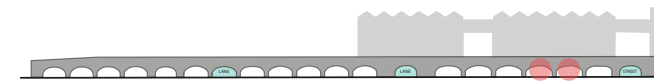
Fragment Elevation of a typical Plot 7 A1 unit
